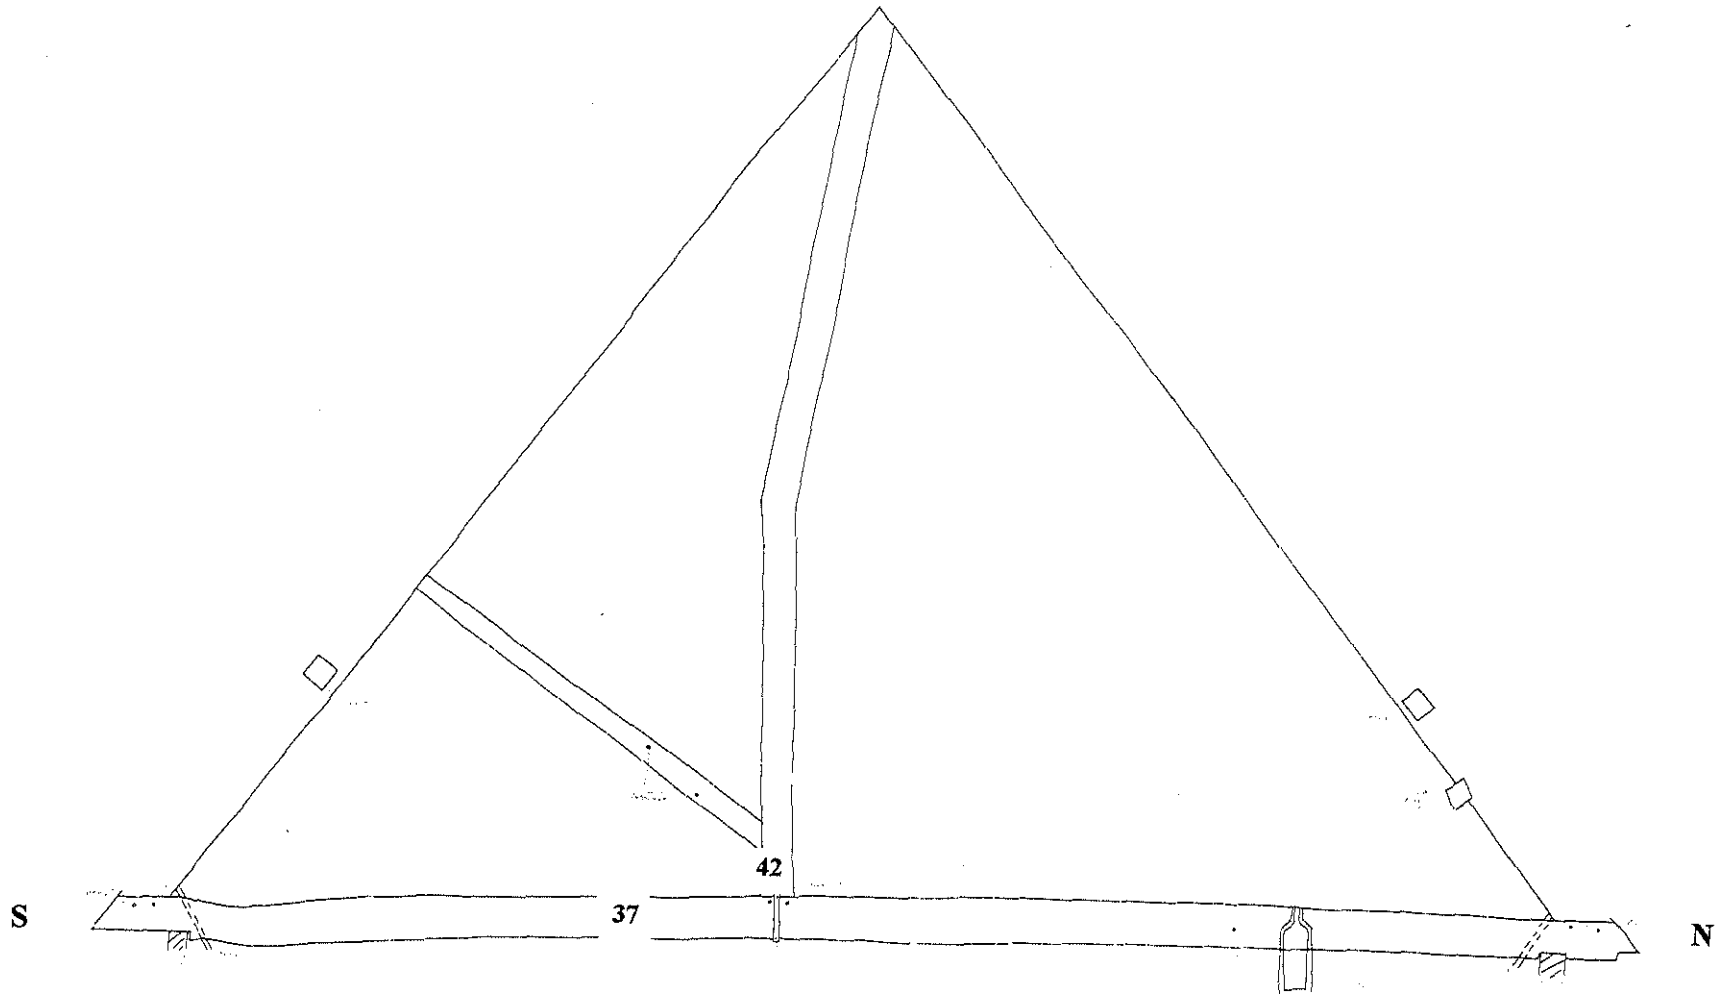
(1): North elevation of choir roof (western half) to show sample locations
